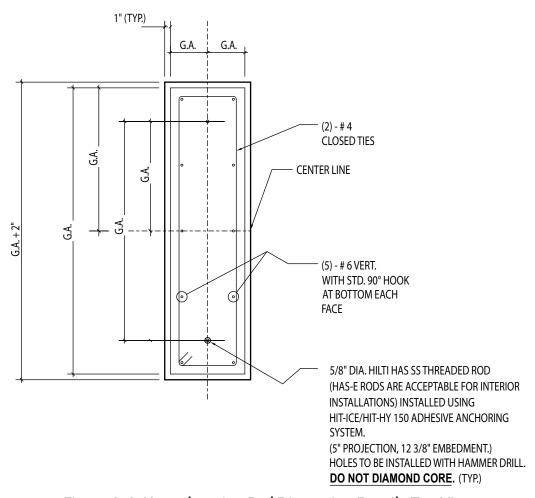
Housekeeping Pad Dimension Detail - Top View
